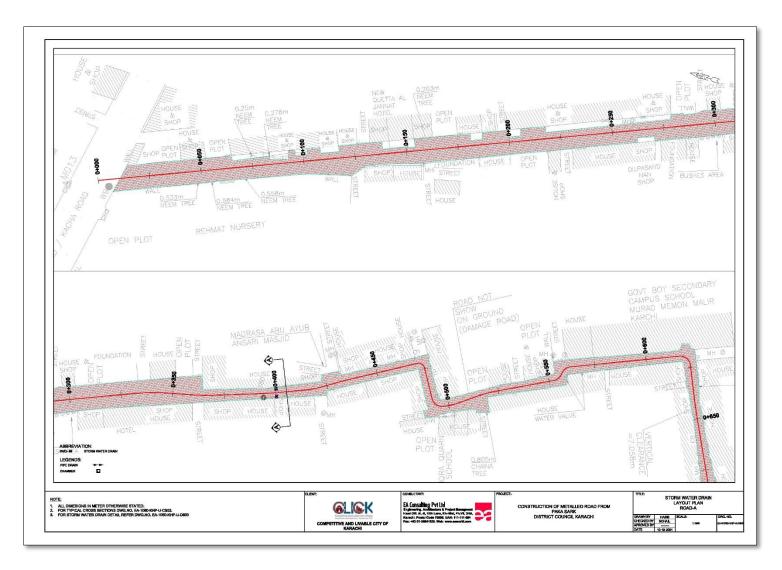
Layout Plan for the Proposed Rehabilitation of Paka Sarak Layout - 01
